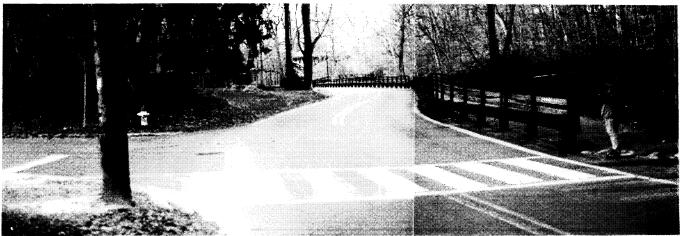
View of existing crossing at Aspen. Speed tables would slow drivers traveling through the intersection.
